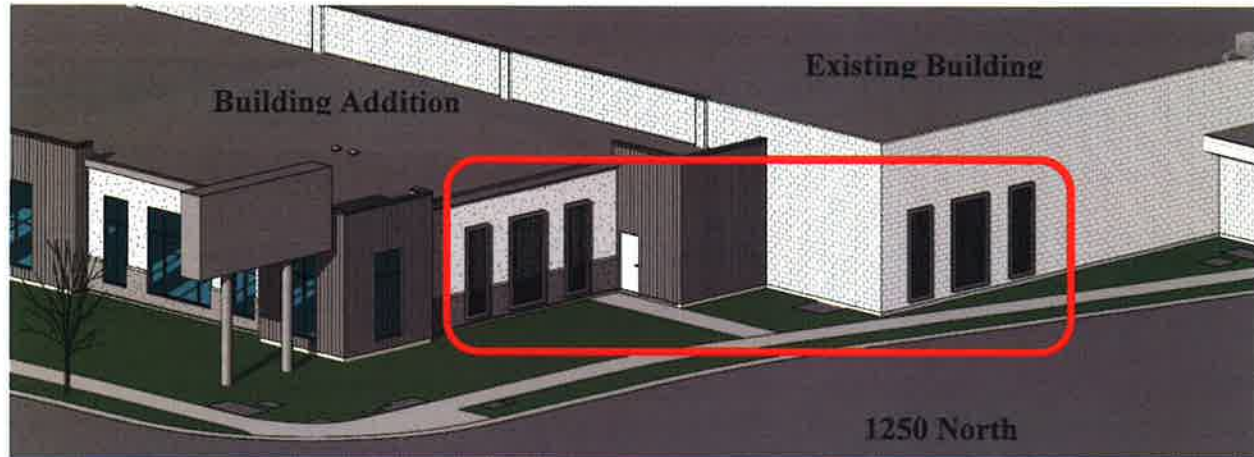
shows the trellising on south facing facades of the new and existing buildings.
